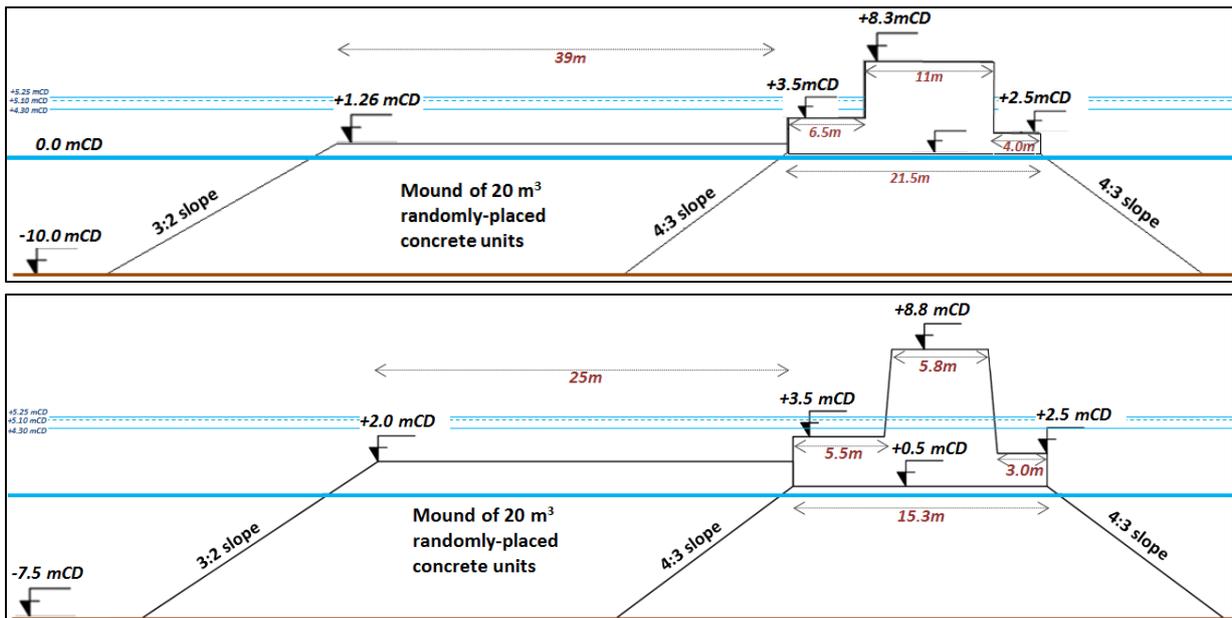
Cross-section of the modelled Artha – top – and Socoa – bottom – breakwaters (distances and elevations in meters prototype).
